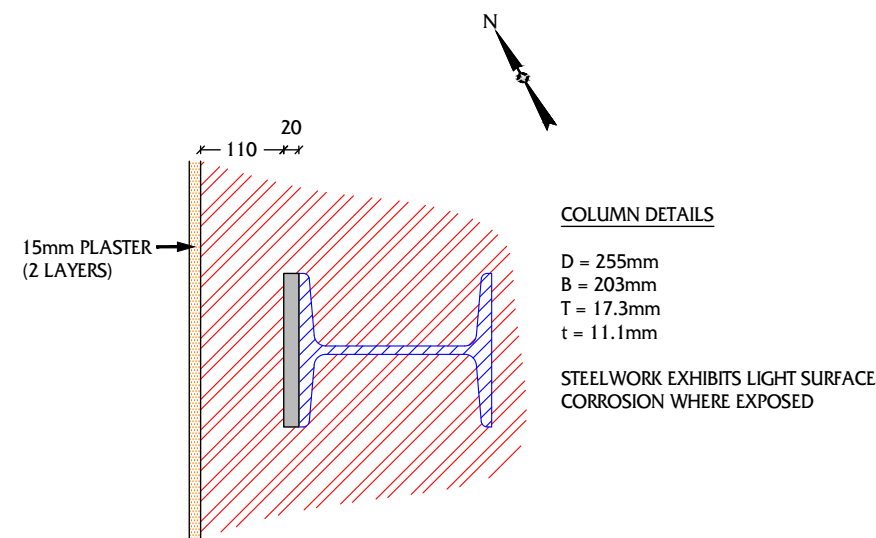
PART PLAN SHOWING DETAILS OF COLUMN L1 SCALE 1:10
